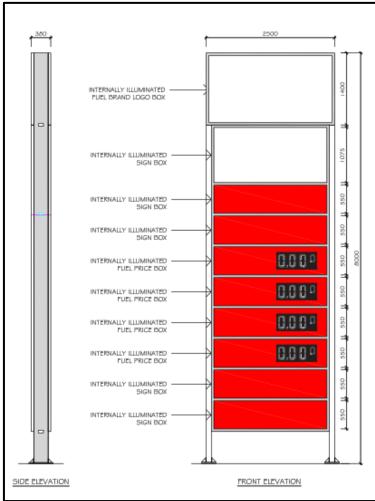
Site ID Details (Source: DA010, dated 24/6/24)
